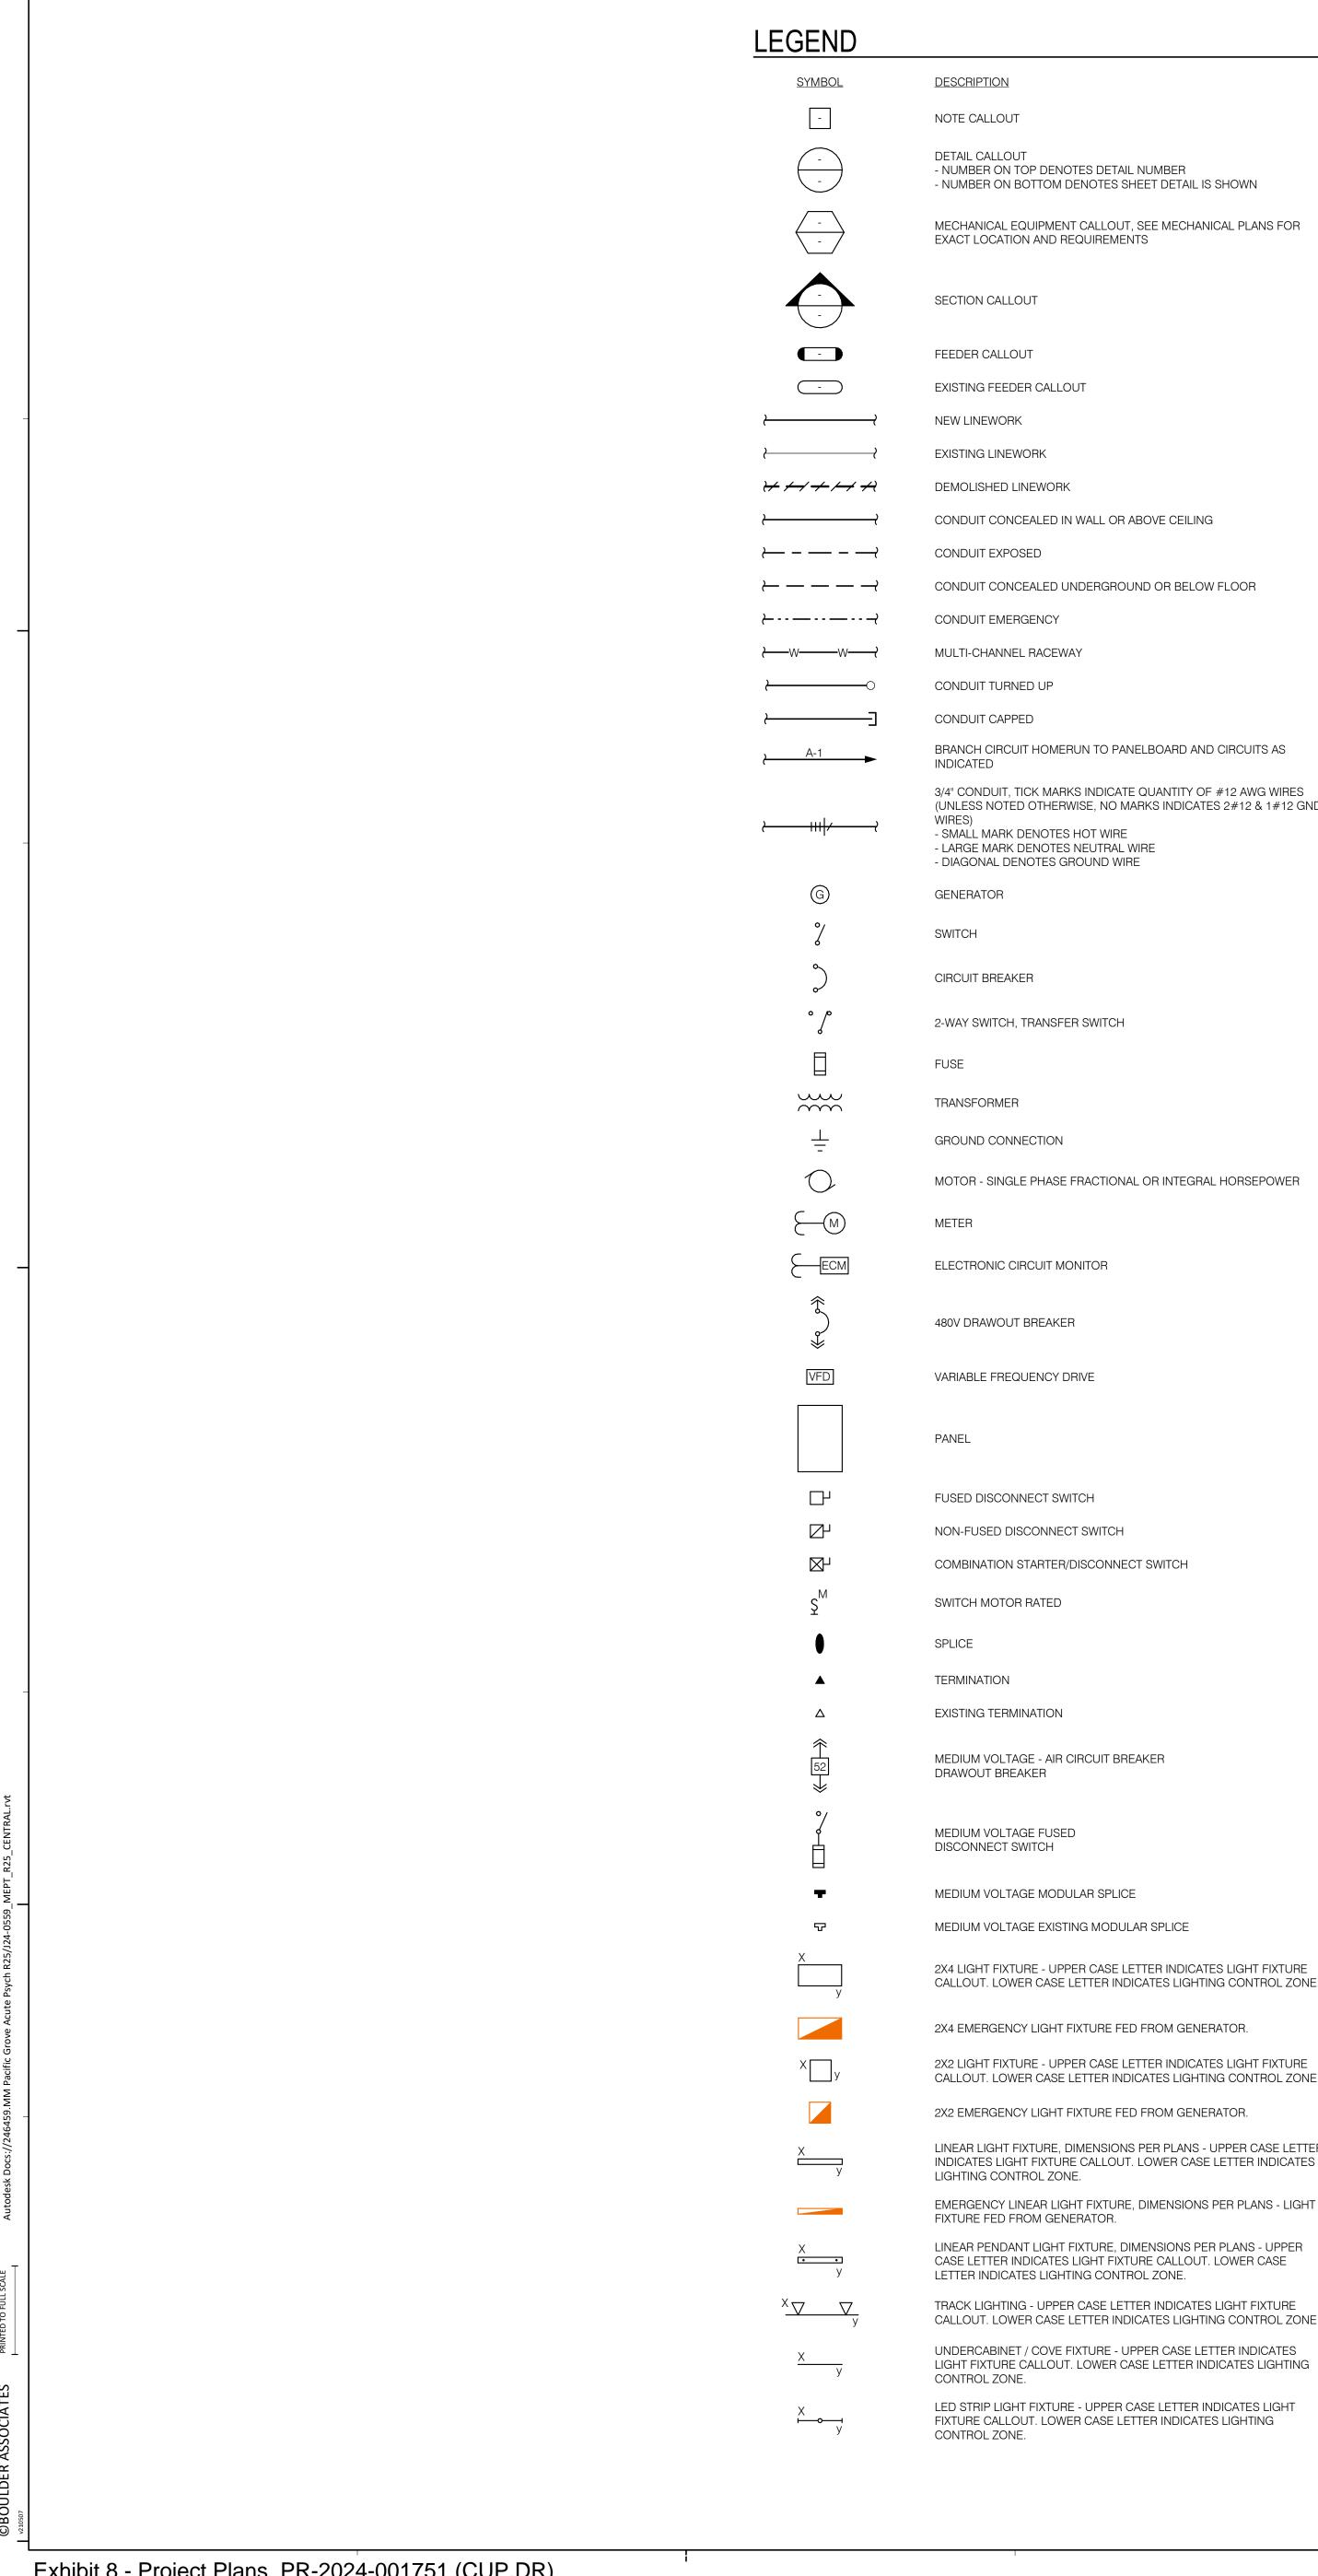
Project Plans PR-2024-001751 (CUP,DR)
